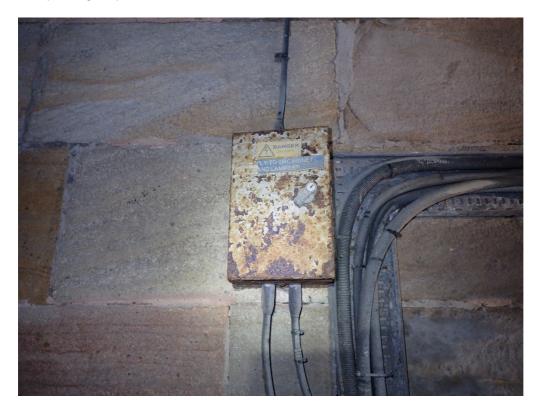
Open and corroded cathodic protection cabinet on the West Abutment back all
